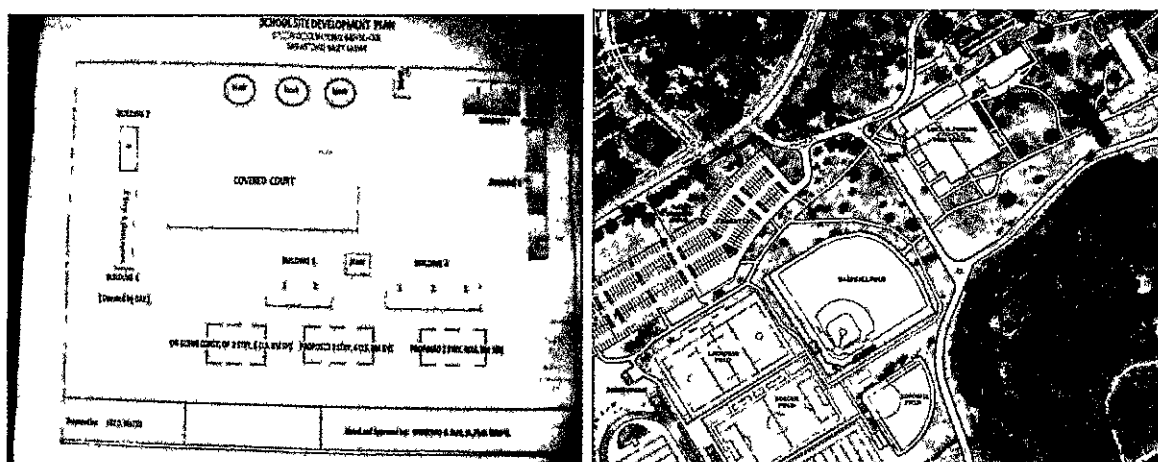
The Semion Ocdol National High School Site Development Plan (Layout). Right: Concept Master Site Plan of an American secondary school (MLive.com)
